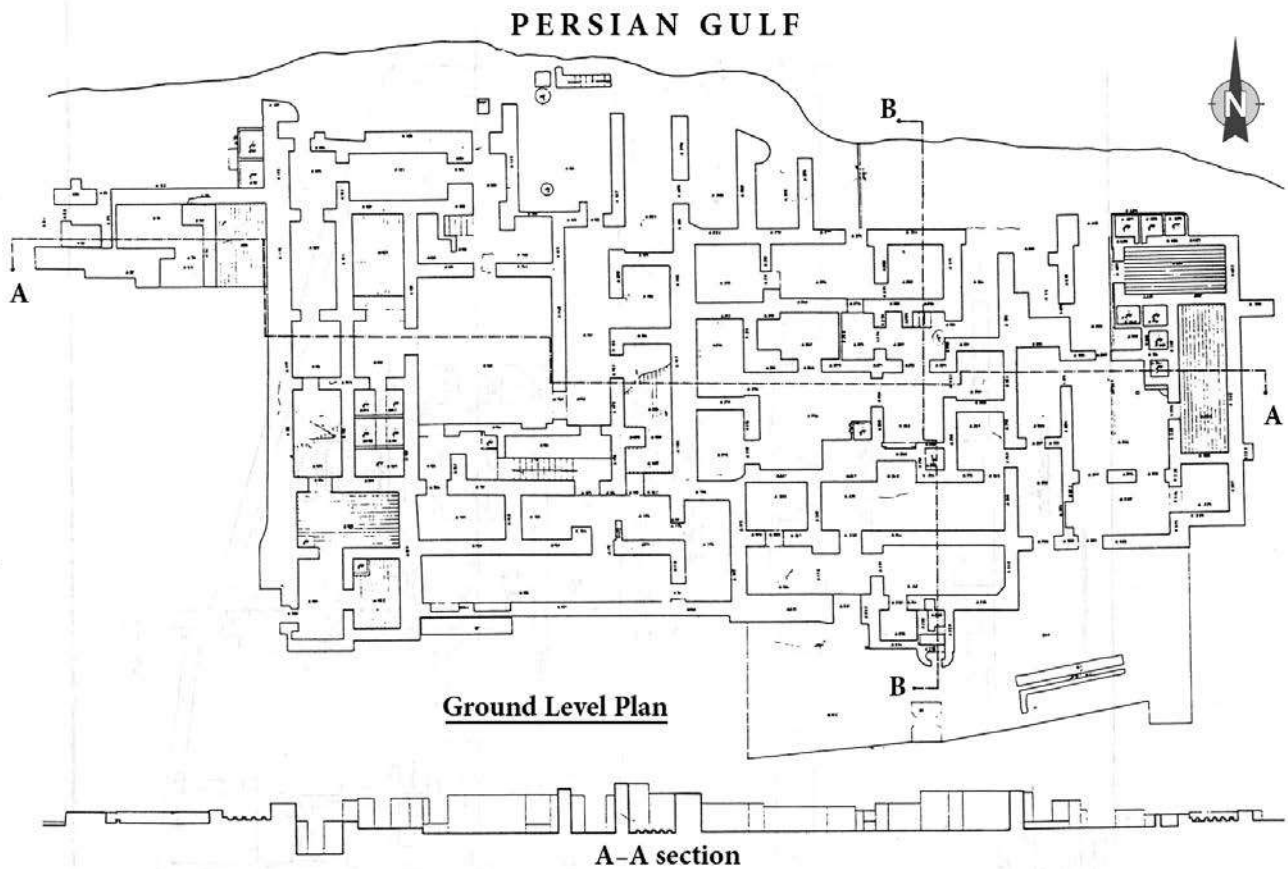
Ground Level Plan After Excavation at Harireh; Kish Island (Mousavi 1997: 238 – with some modifications)
